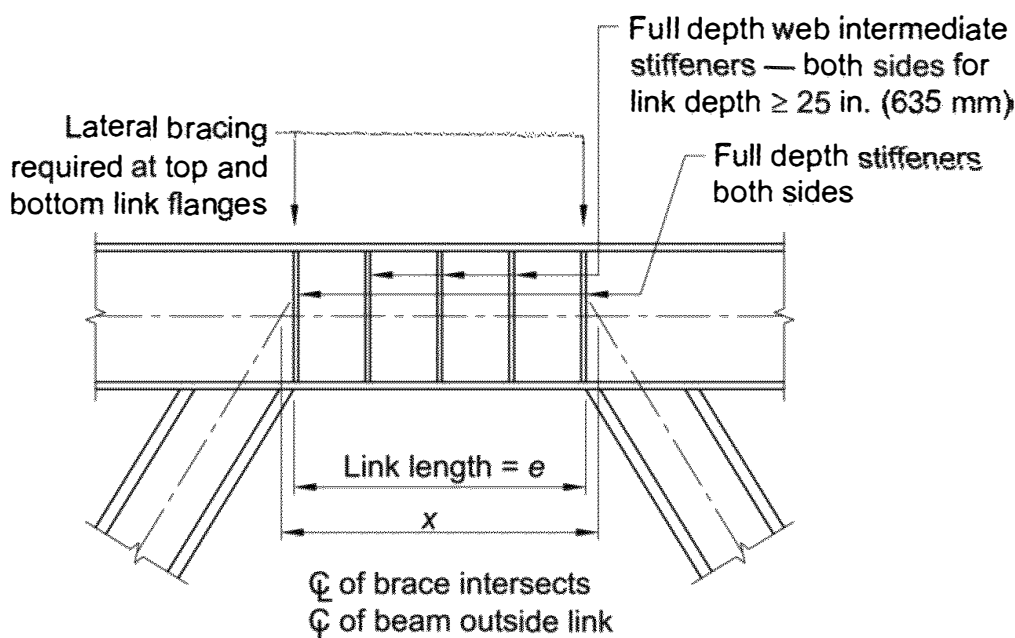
EBF with W-shape bracing ($x > e$).
